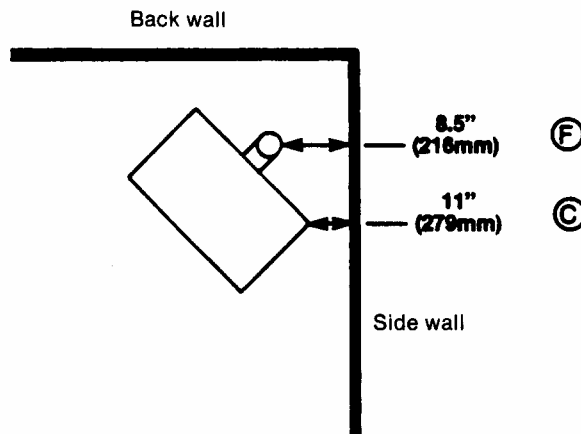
F. Top Vent, Corner Installation (Harmony Coal Stove with Single Wall Pipe)
